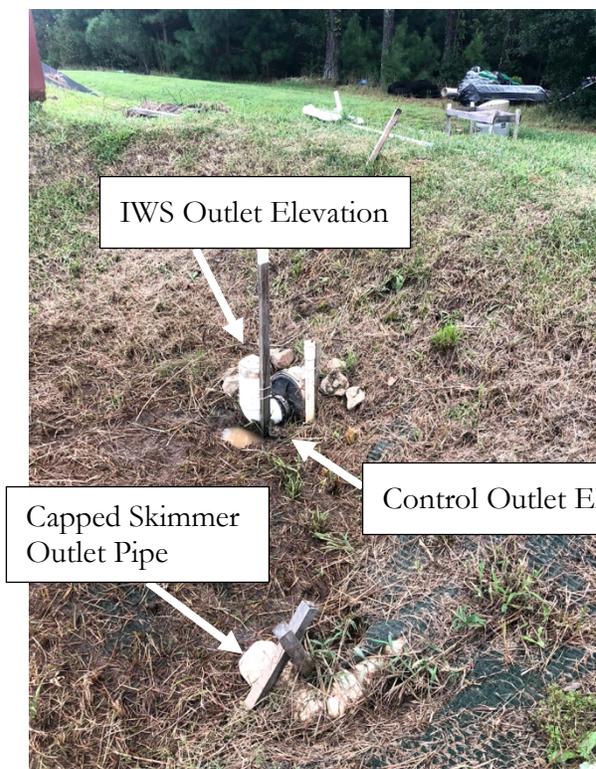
Elevated outlet orifice in IWS configuration pre-gravel installation
